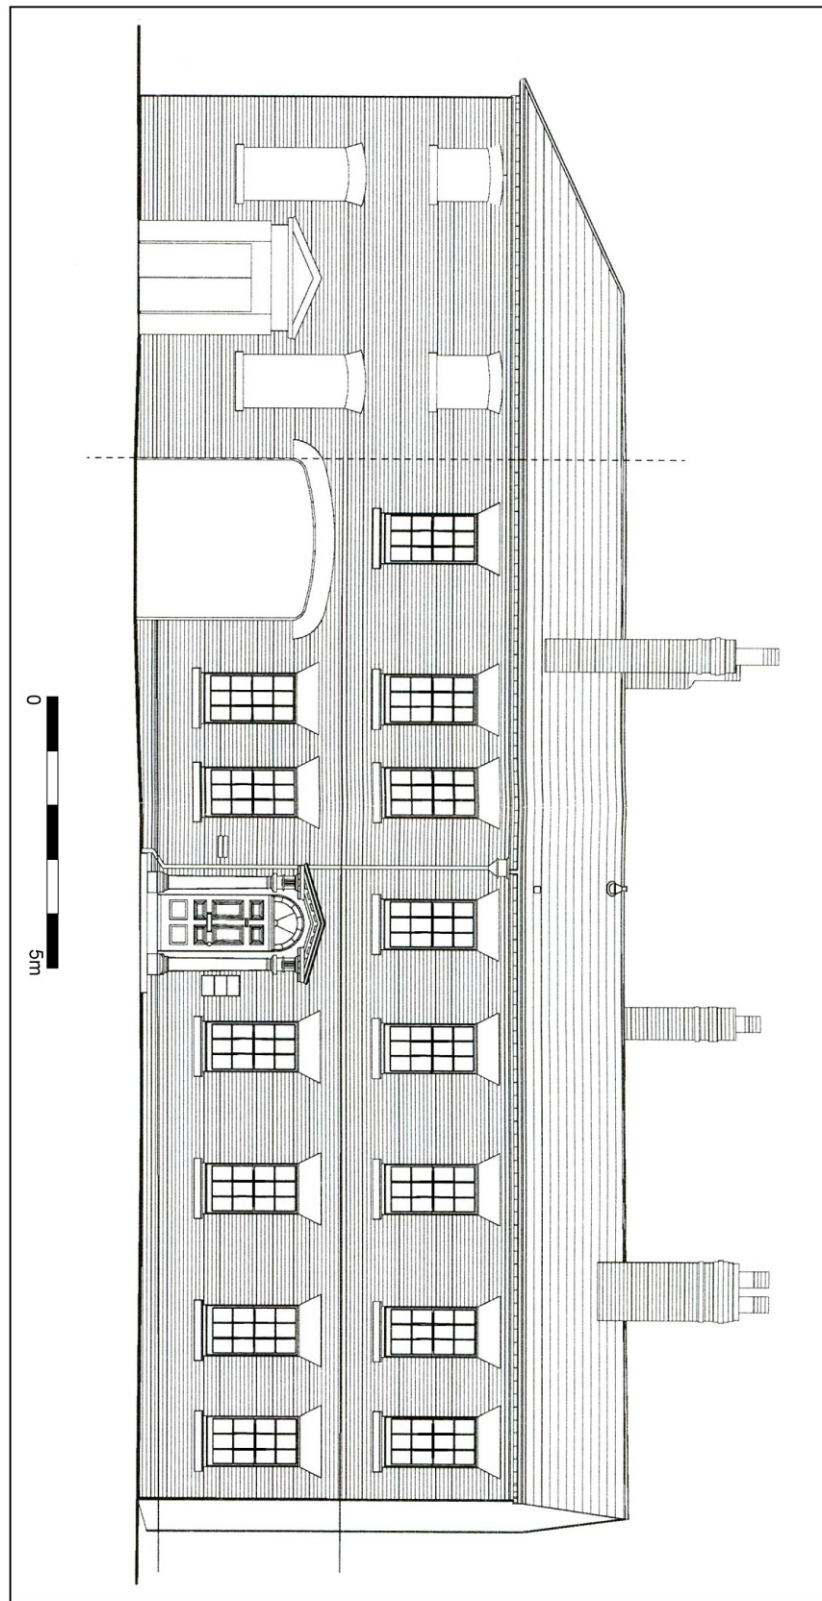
Rear (W-facing) Elevation to No. 38 South Street
